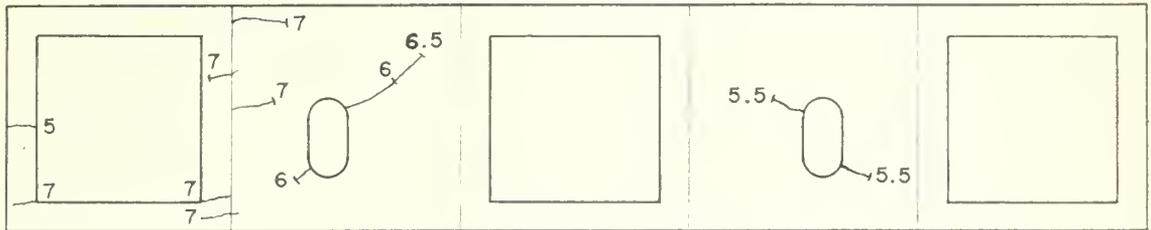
CRACK PATTERN IN BEAMS NO. 13 & 14
